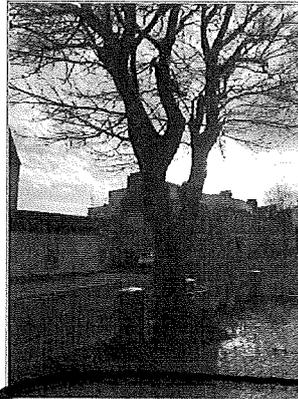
Mature tree to front elevation causing cracking to front parking area.
